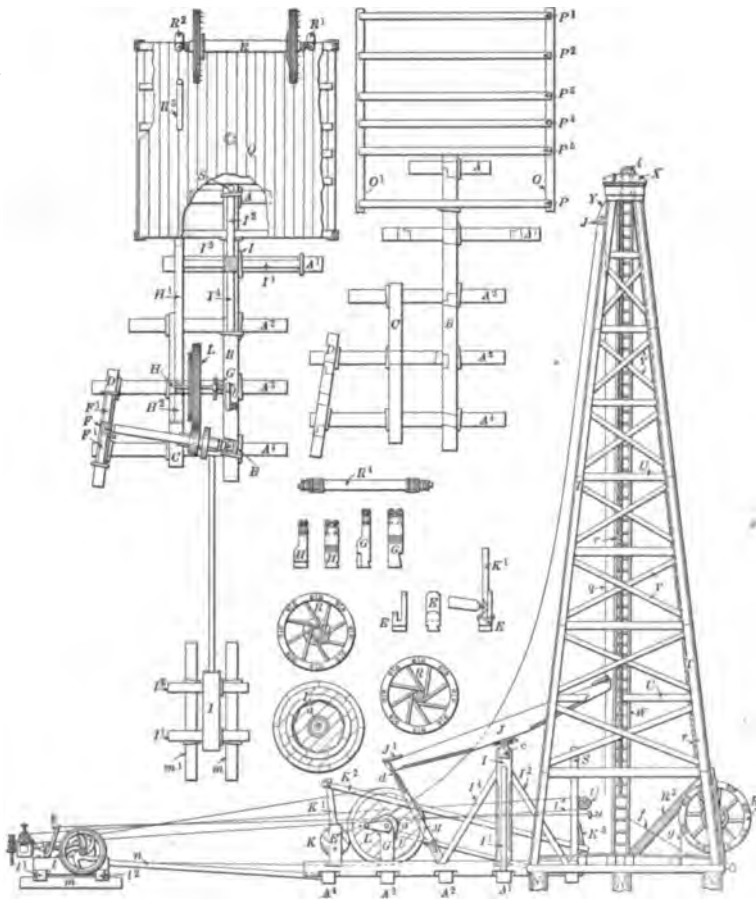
Side elevation and ground plan of the "Standard" rig.
